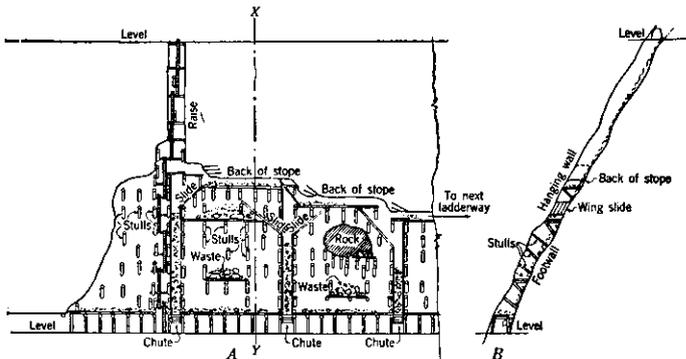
Overhand open-stull stope: A, Longitudinal projection; B, cross section on line X-Y
